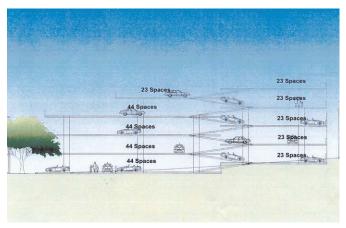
(s): West Precinct public car parking concept plan.(E)
